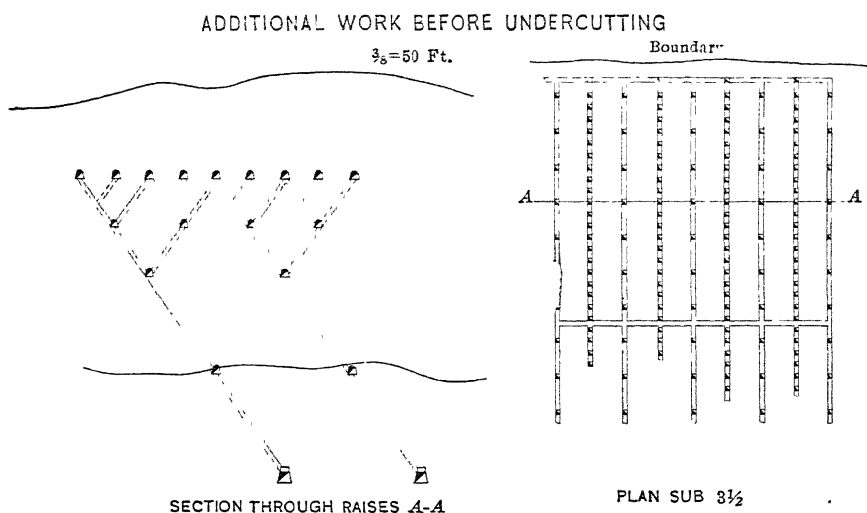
PRECEDING UNDERCUTTING, THE TOPMOST LEVEL IS DEVELOPED BY DRIFTS SPACED ON 25-FT. CENTERS AND CONNECTED WITH THE BRANCH, OR "FINGER RAISES."
